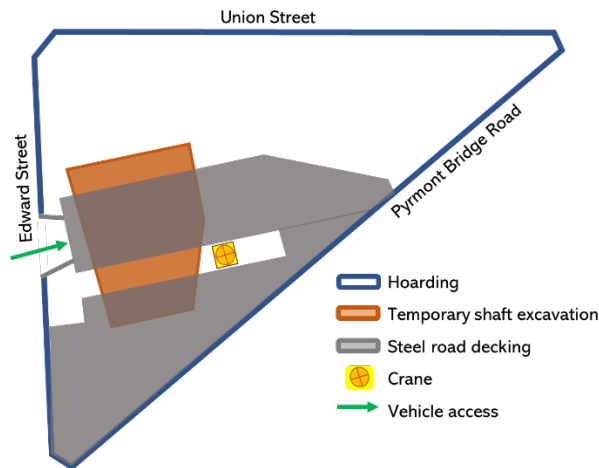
Indicative site layout showing temporary shaft excavation area and road deck layout
